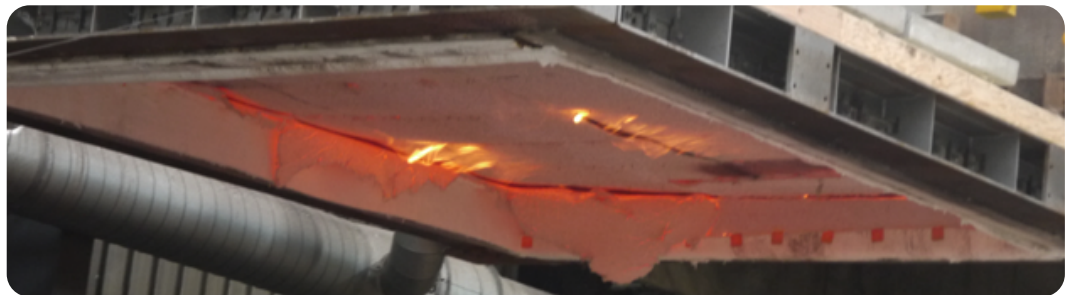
Fire-exposed face of lightweight loaded timber floor system after 90-minute fire resistance test.
